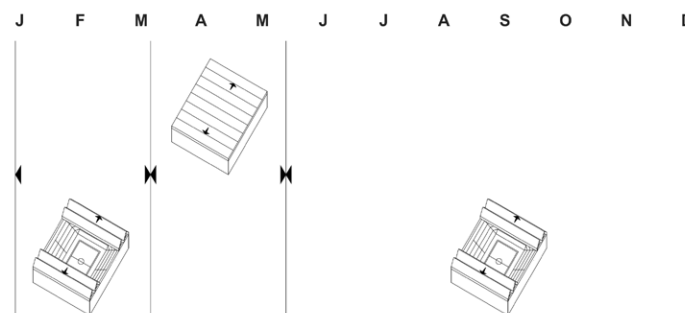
Demonstration of roof structure movement in buildings with primarily open roofs that are closed in special cases (annual opening and closing).
